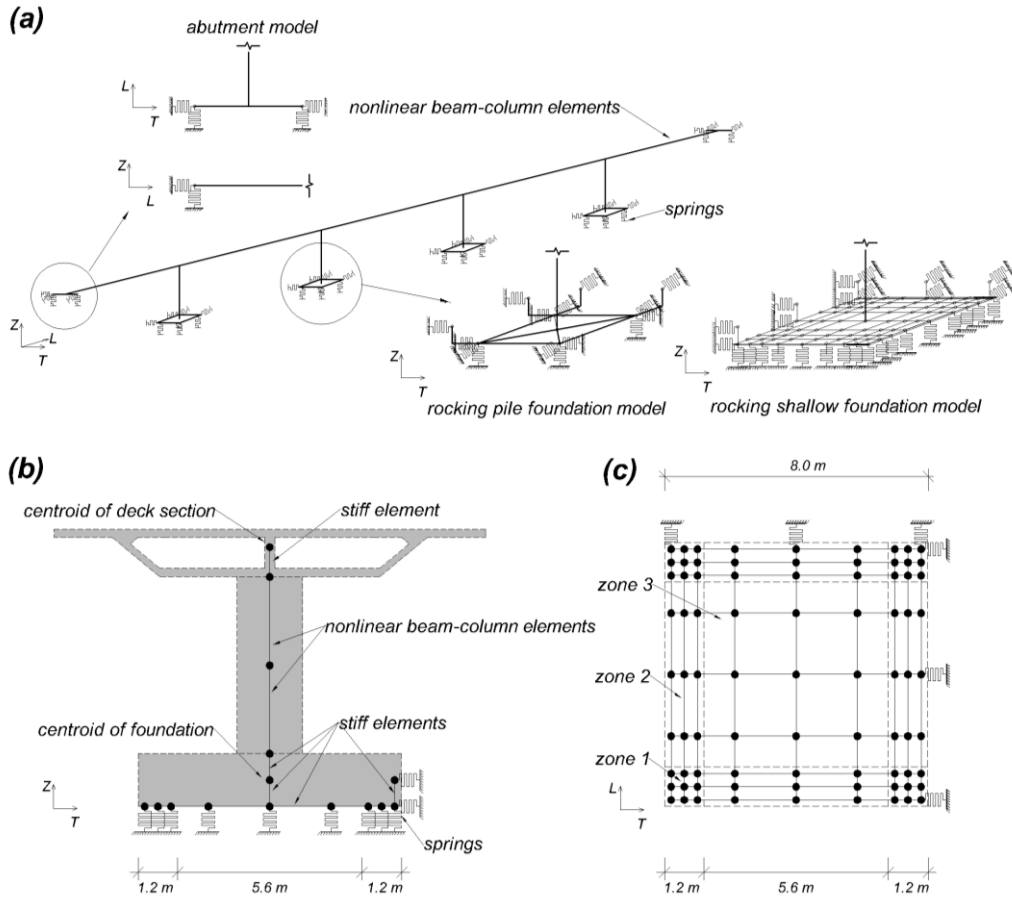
Schematic of the numerical model: (a) three dimensional view; (b) elevation section view of the foundation, column and deck of bridge RSF8; and (c) plan view of the model of the rocking shallow foundations.
